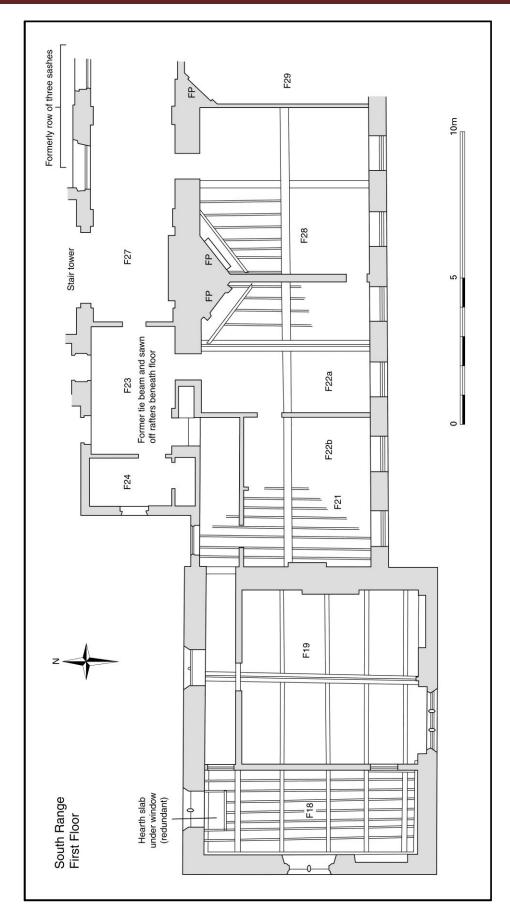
The floor-framing of the South Range First Floor. (Andy Isham)
